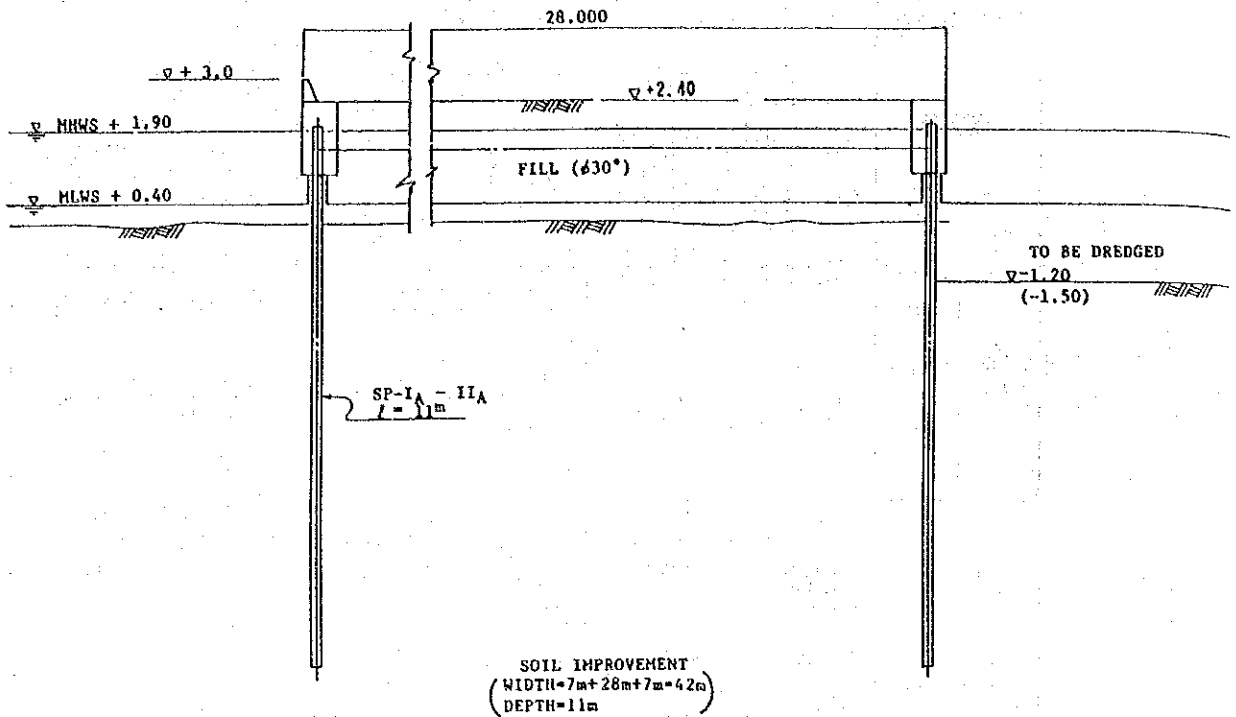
, TYPICAL SECTION OF MAIN JETTY
